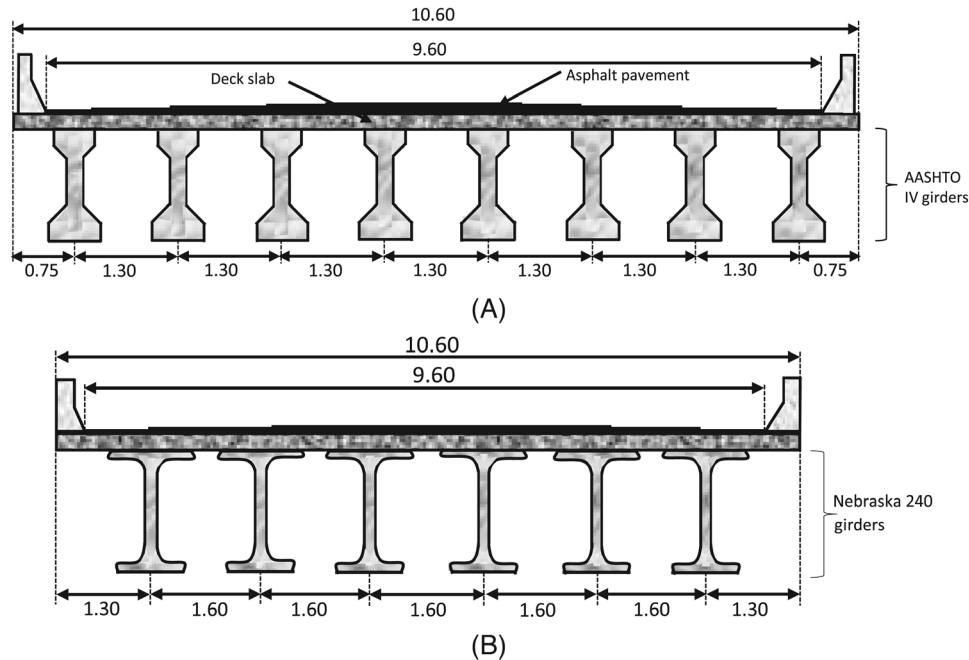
Bridges cross section. (A) AASHTO IV girders for 30 m span bridges and (B) Nebraska 240 girders for 50 m span bridges
